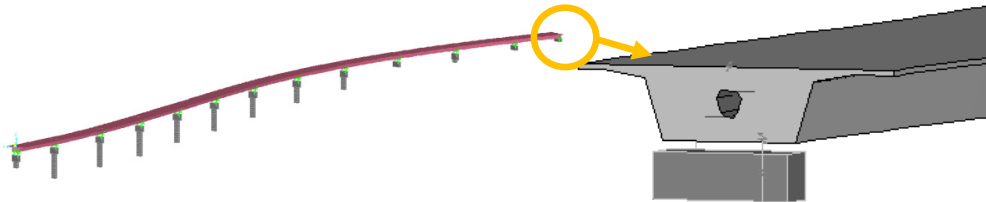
3D FE model: whole Southbound Bridge (left) and deck cross section at abutment SA (right).
